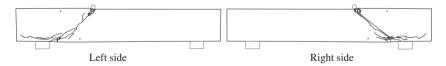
Beam 18 (reinforced concrete beam without stirrups) crack pattern.
